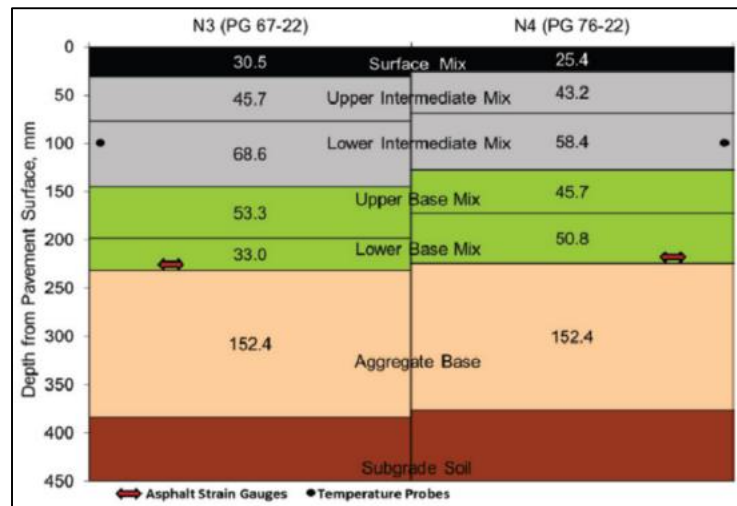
As-built structural cross sections and instrumentation (Timm, et al., 2014).
